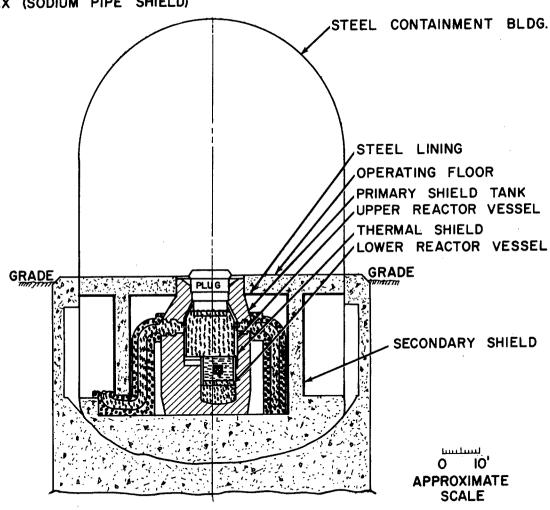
FIG. I CROSS-SECTIONAL VIEW OF FERMI-PLANT CONTAINMENT BUILDING
